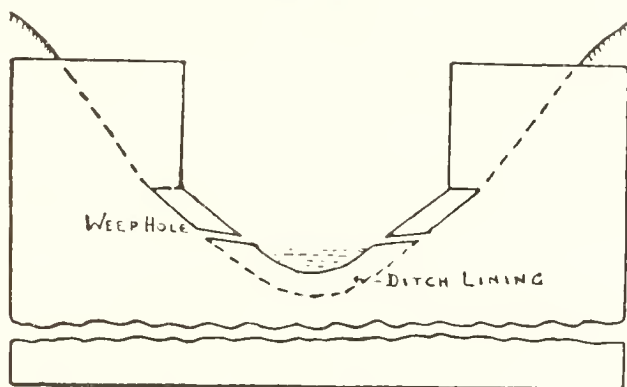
Cross section of key-wall. (After Le Prince, 1915.)
